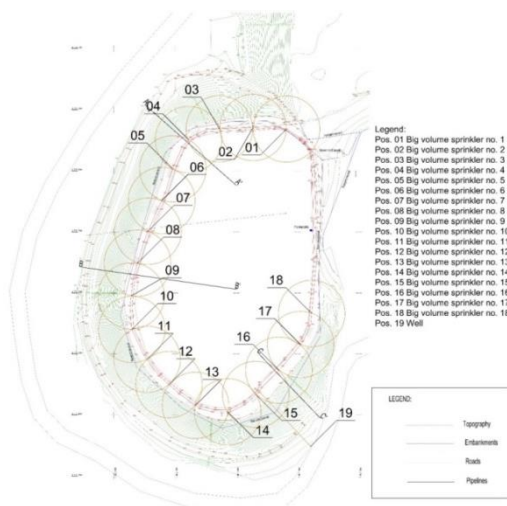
Layout of the installation for sprinkling the Leposavić tailing dump
